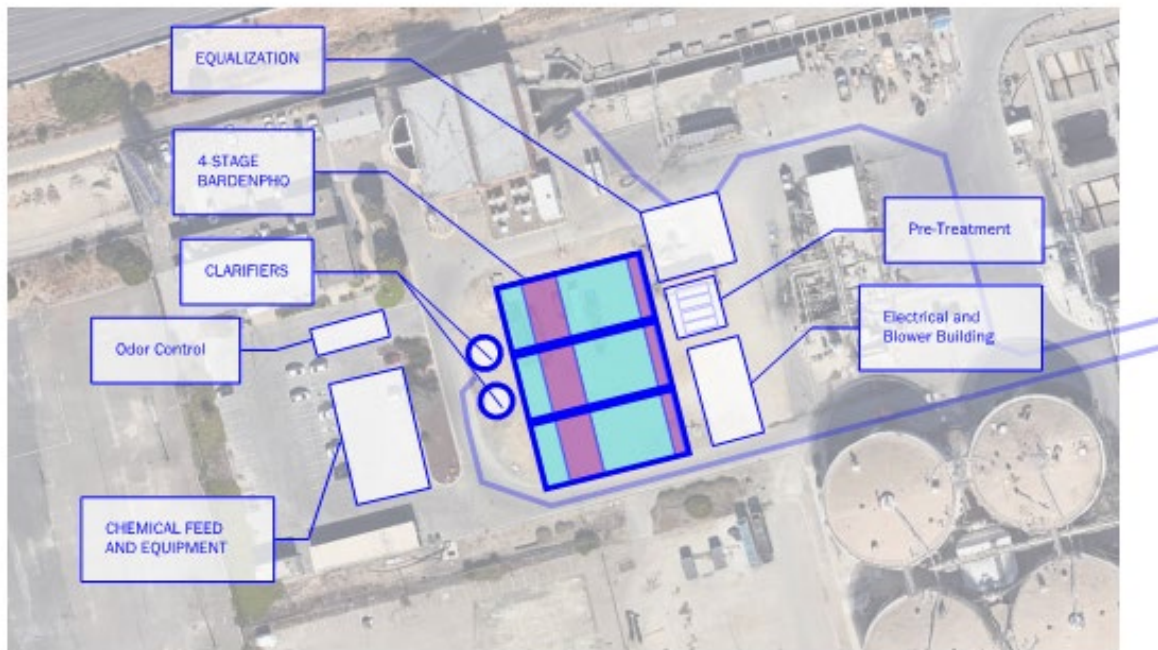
Alternative N1 – 4-Stage Bardenpho (West of SLW Receiving Station)
